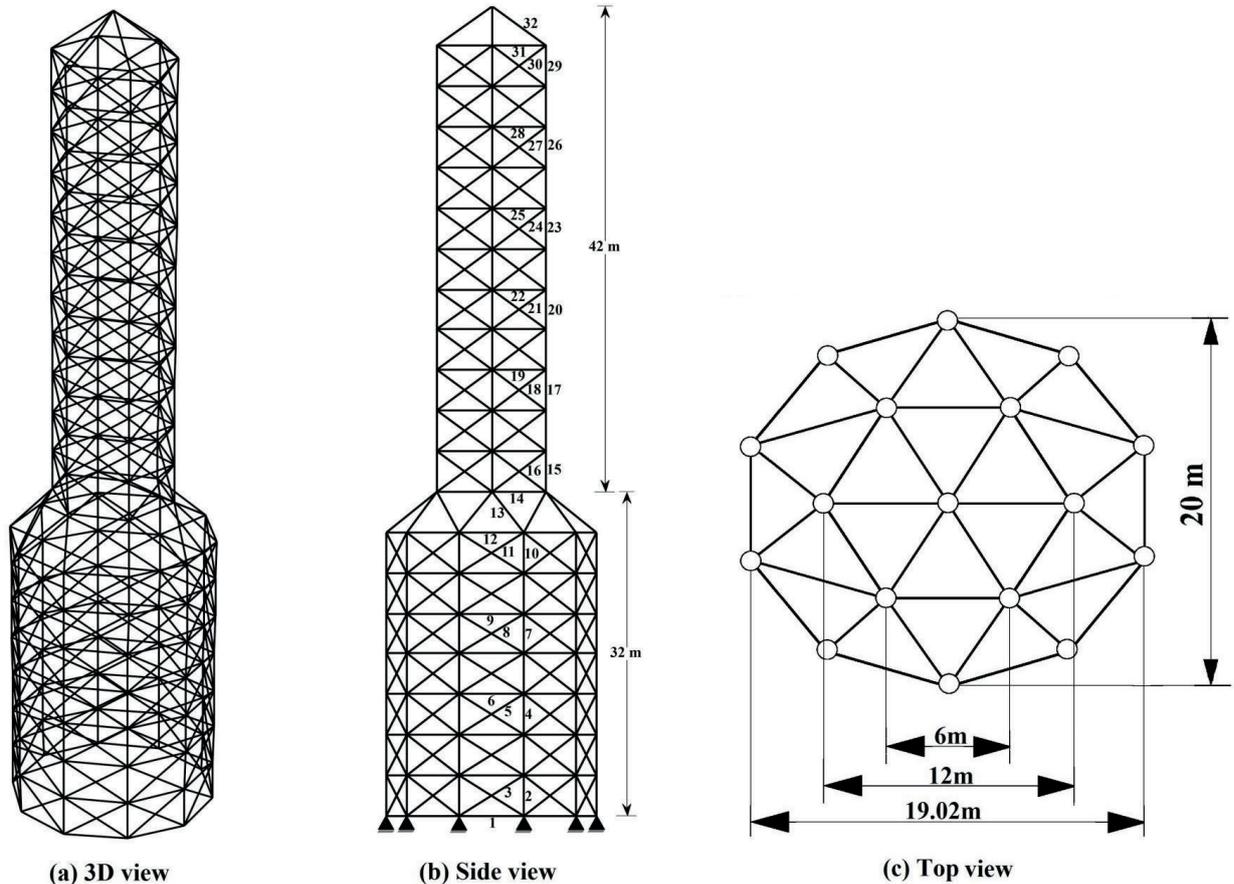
Schematic of the 582-bar tower truss structure: 3D, Side and top views.
